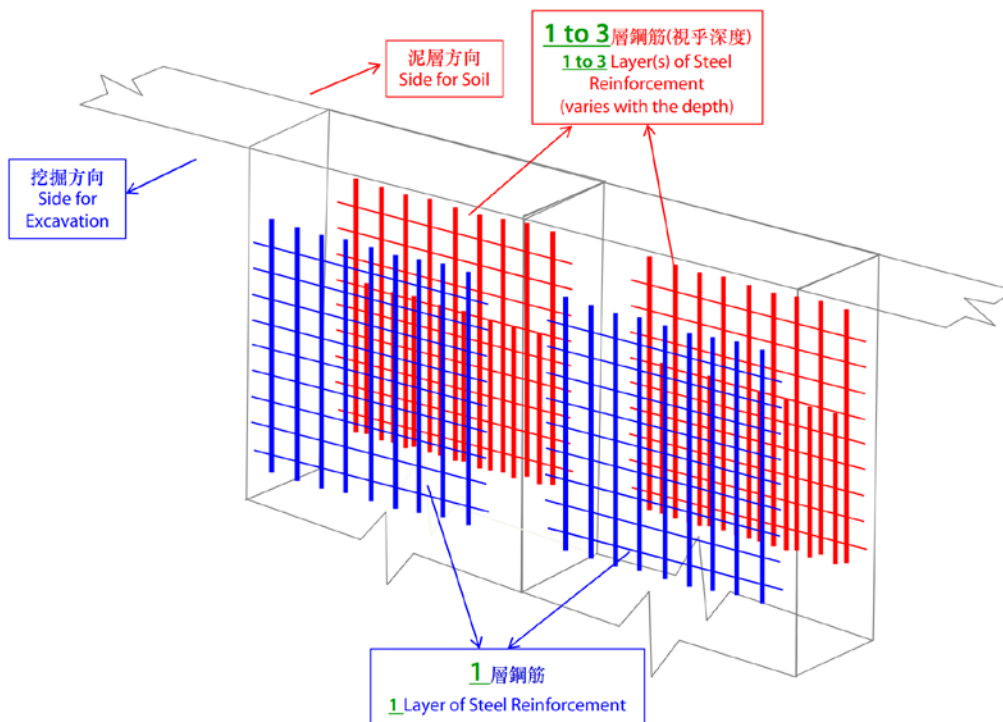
Layer(s) of steel reinforcement in shop drawings
